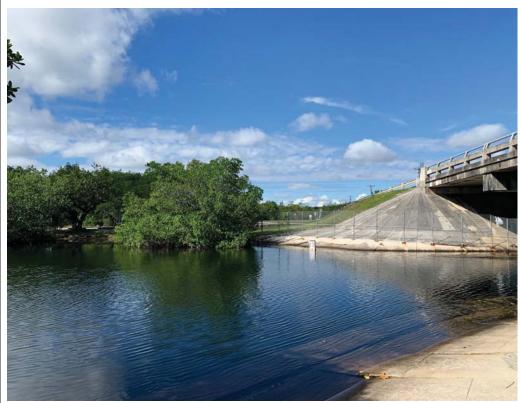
View of mangroves and upland trees adjacent to the bridge, from east side, south of bridge, facing northwest.
